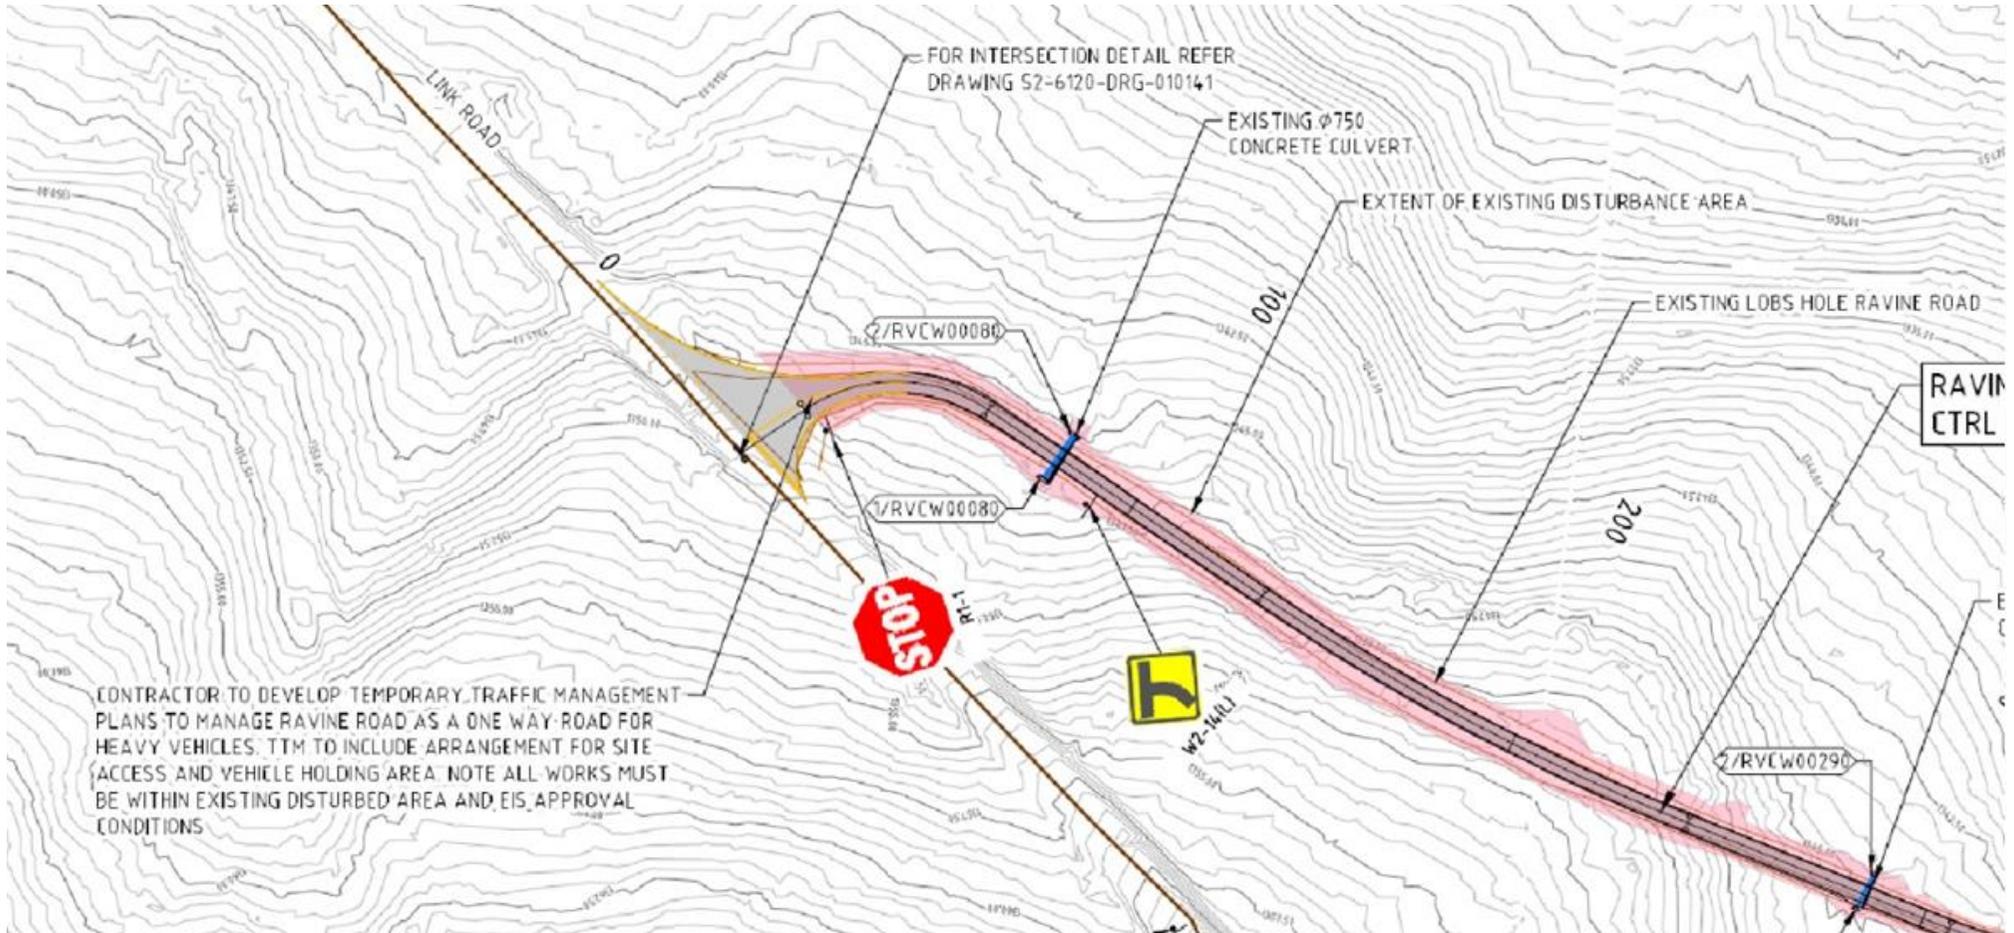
Indicative layout of lay-up area at the intersection of Link Road and Ravine Road
